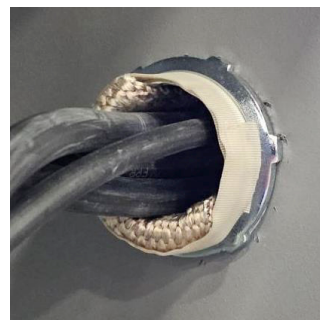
Insulating bushing folded over connector threads and secured with three or five tight layers of 3M 69 Glass Cloth tape.
